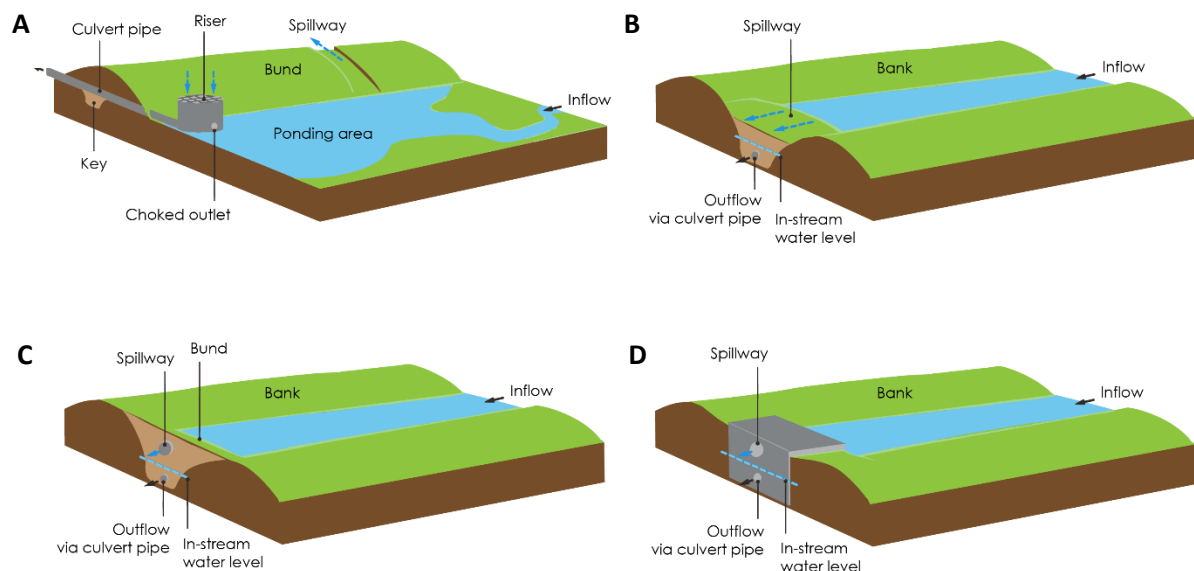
A) detainment bund with choked outlet and concrete riser (Clarke, 2013; Paterson et al., 2014); B) low earth check dam with spillway; C) high earth check dam with piped spillway; D) concrete check dam with piped spillway (adapted from Paterson et al., 2014). (Note: these designs are illustrated to show the designs during a runoff event).
